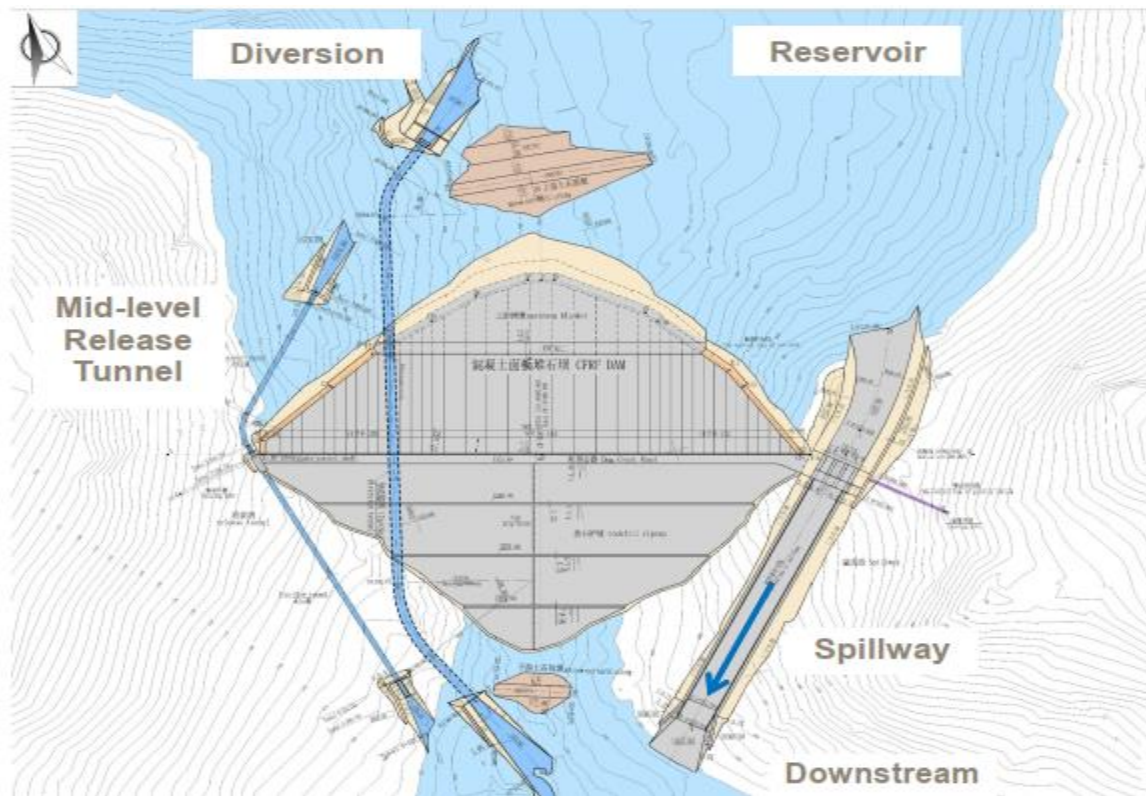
Layout Plan of Dam Area Structures [EEP March 2017]
